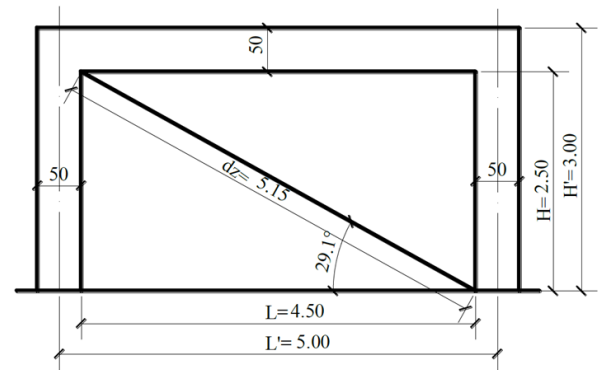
Masonry infilled reinforced concrete frame (Samoilă 2012)
